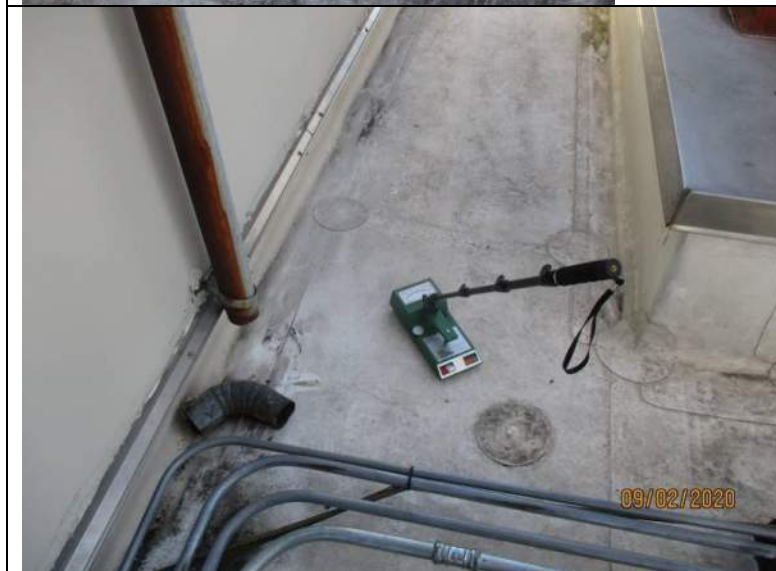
Roof area between cell site equipment and penthouse that felt soft when walked on.
